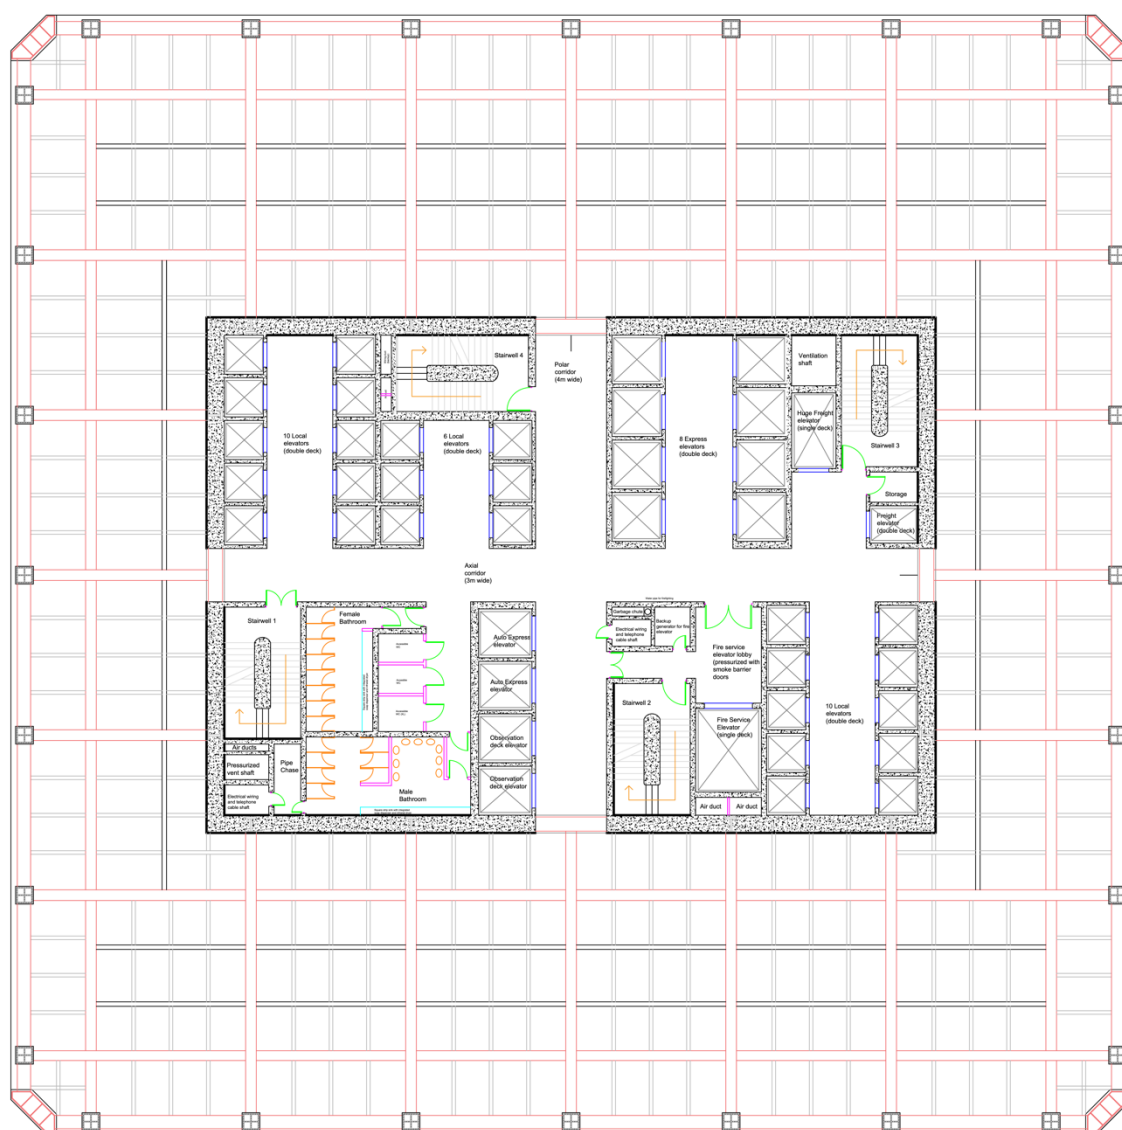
AutoCAD structural floorplan of the perimeter columns and central UHPC core, with elevators, stairwells, and other facilities illustrated.
